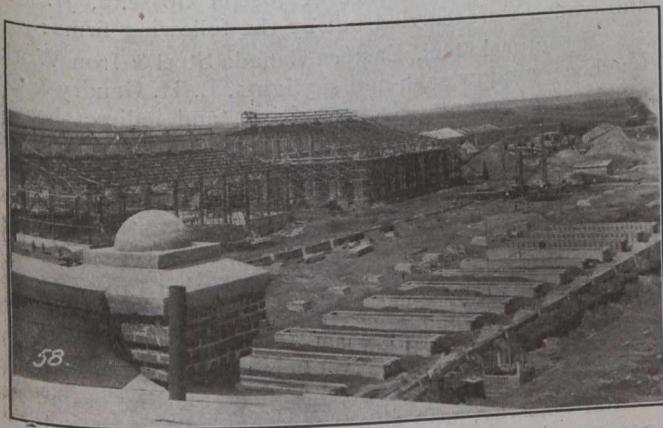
View from Roof of Office Building, showing Engine Pits in Locomotive Shop and Steel Framework of Forge and Power House.
